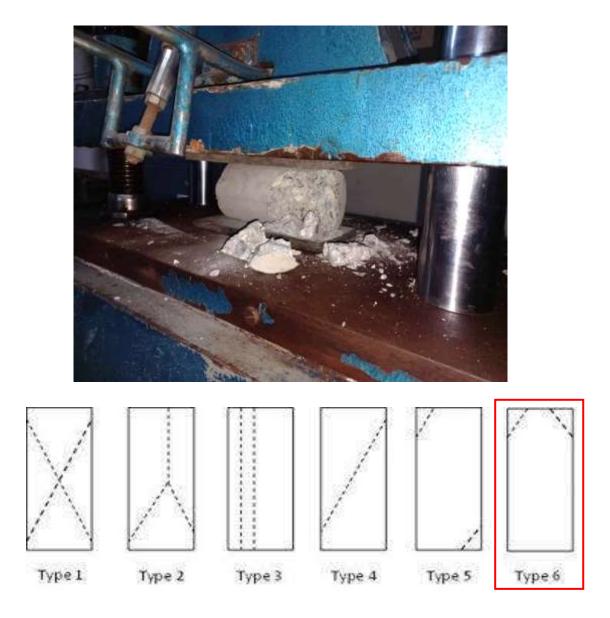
Crash pattern of Cylinder No-3 of Batch Plant Concrete.
